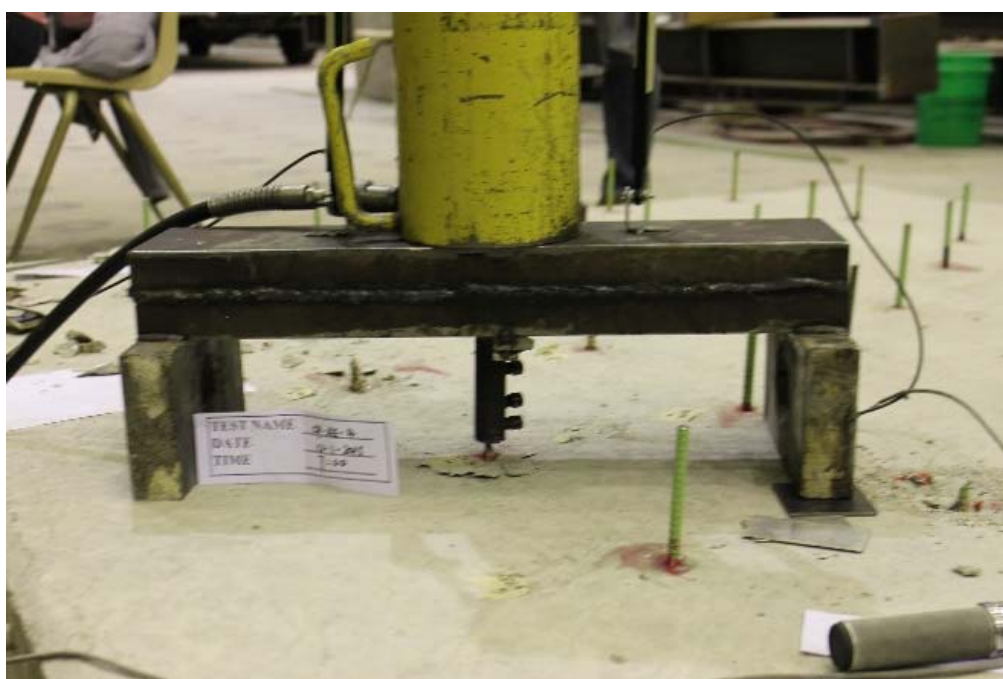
Detailed view of the reinforcement at failure for CP-AE-4
